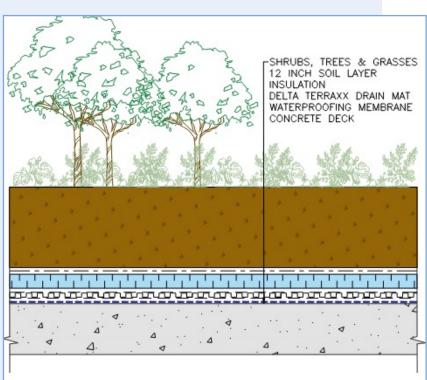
Podium Deck Waterproofing – Landscaping or Intensive Green Roof
